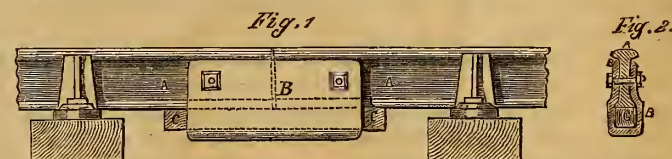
is a side elevation; A A, the rails; B B, improved fish; C, wedge-piece.
